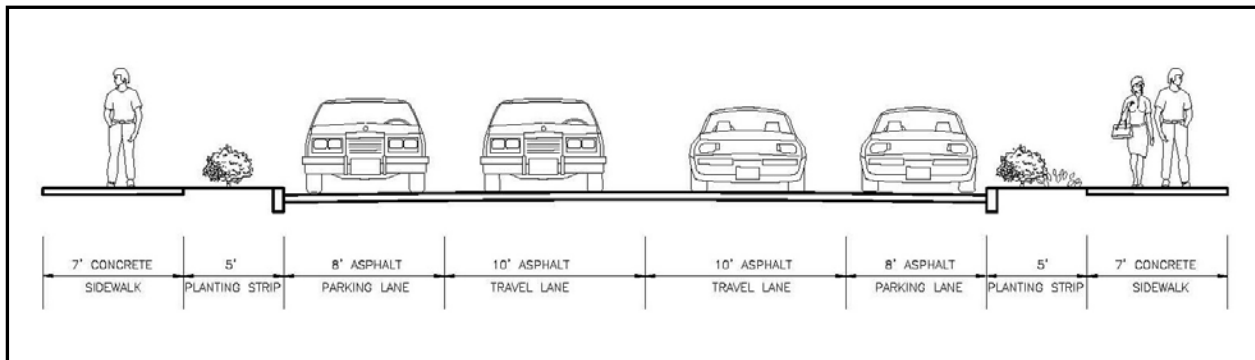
Gex Drive/Noma Drive Connection - Proposed Roadway Layout
